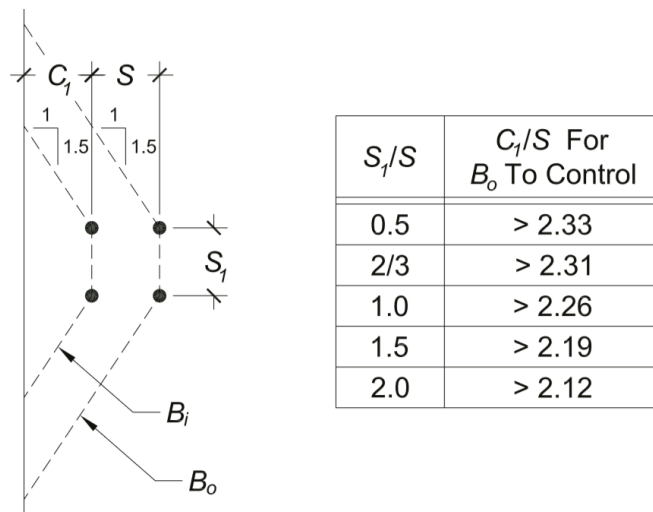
Slope of breakout cone and directives for controlling breakout surface for shear on anchors.⁸⁸
